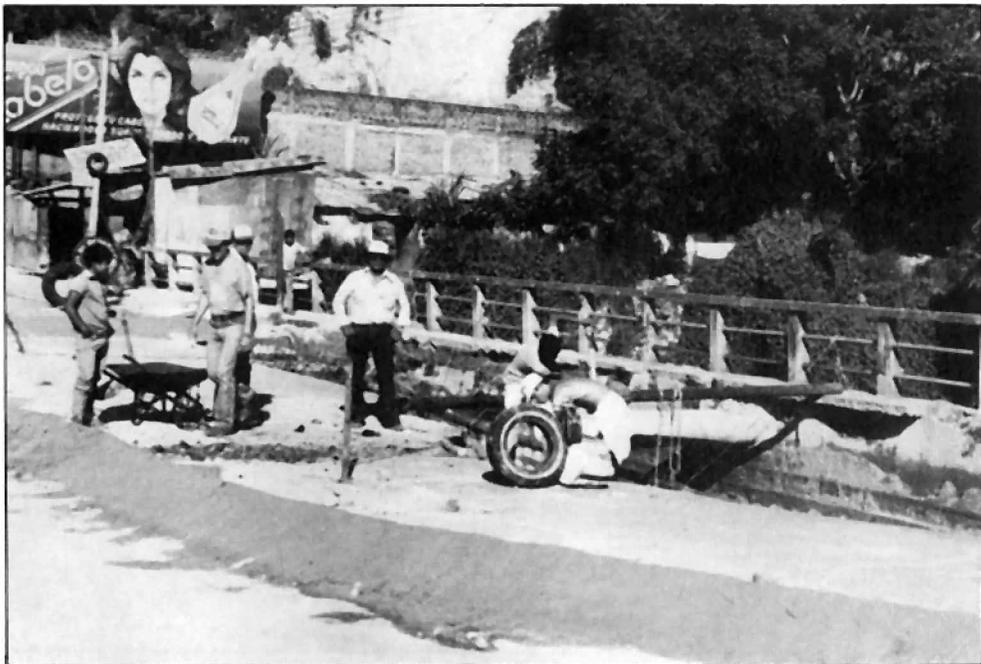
DAMAGED BRIDGE IN MEJICANOS.
